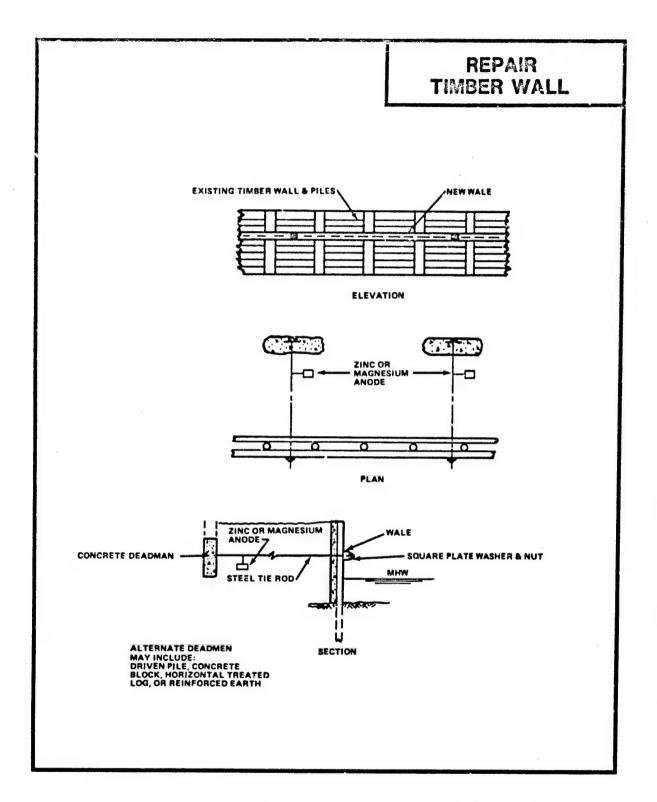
Installing or Replacing Tie-Back System for Timber Sheet Piling Wall.
